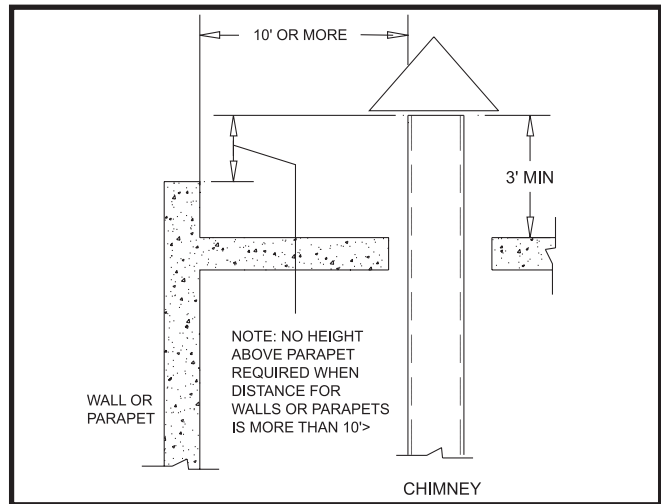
Vent Termination from Flat Roof More Than 10' from Parapet Wall
